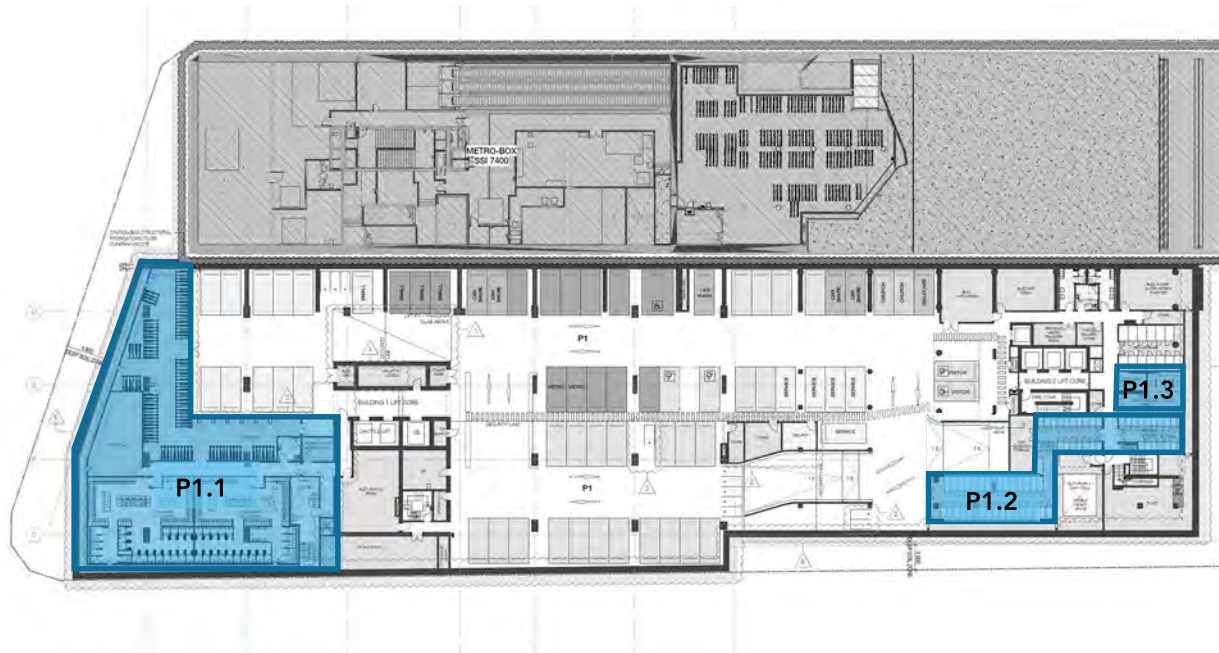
Basement Floor Plan Level P1, Rev E (Source: Woods Bagot)
